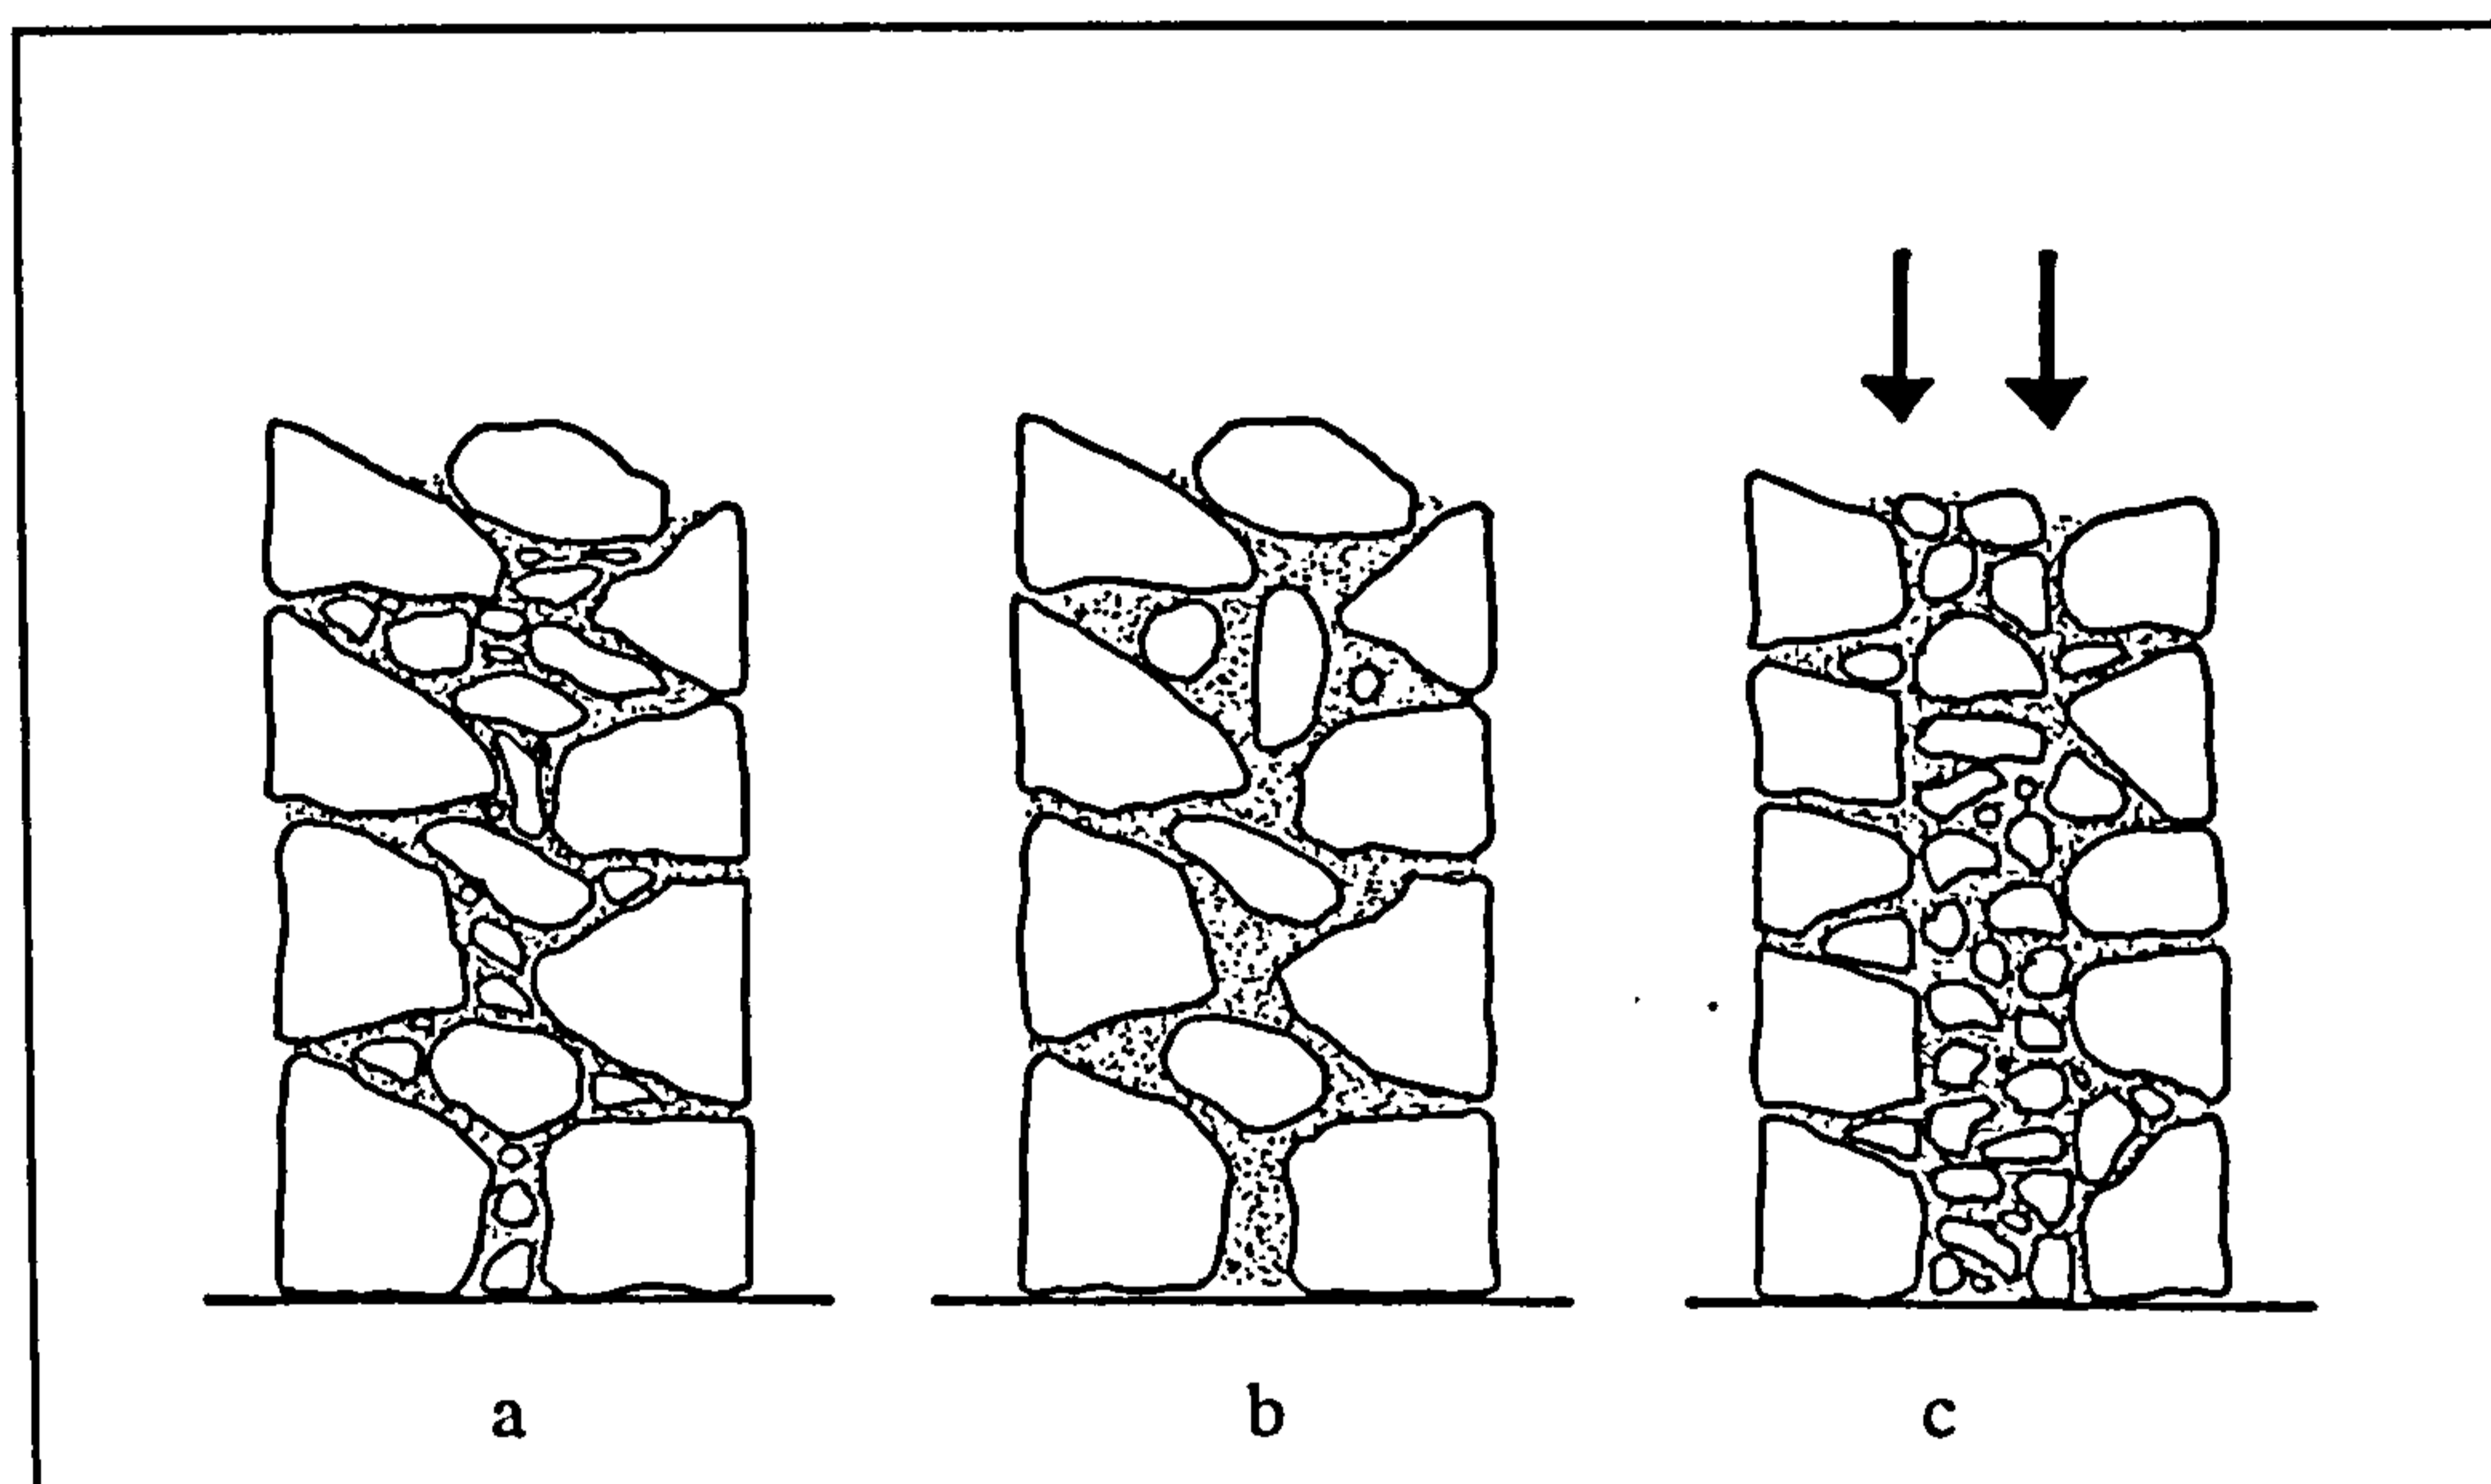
Well constructed masonry with rubble of various sizes (a), weak masonry with small stones missing (b) and masonry with weak internal bond (c).
